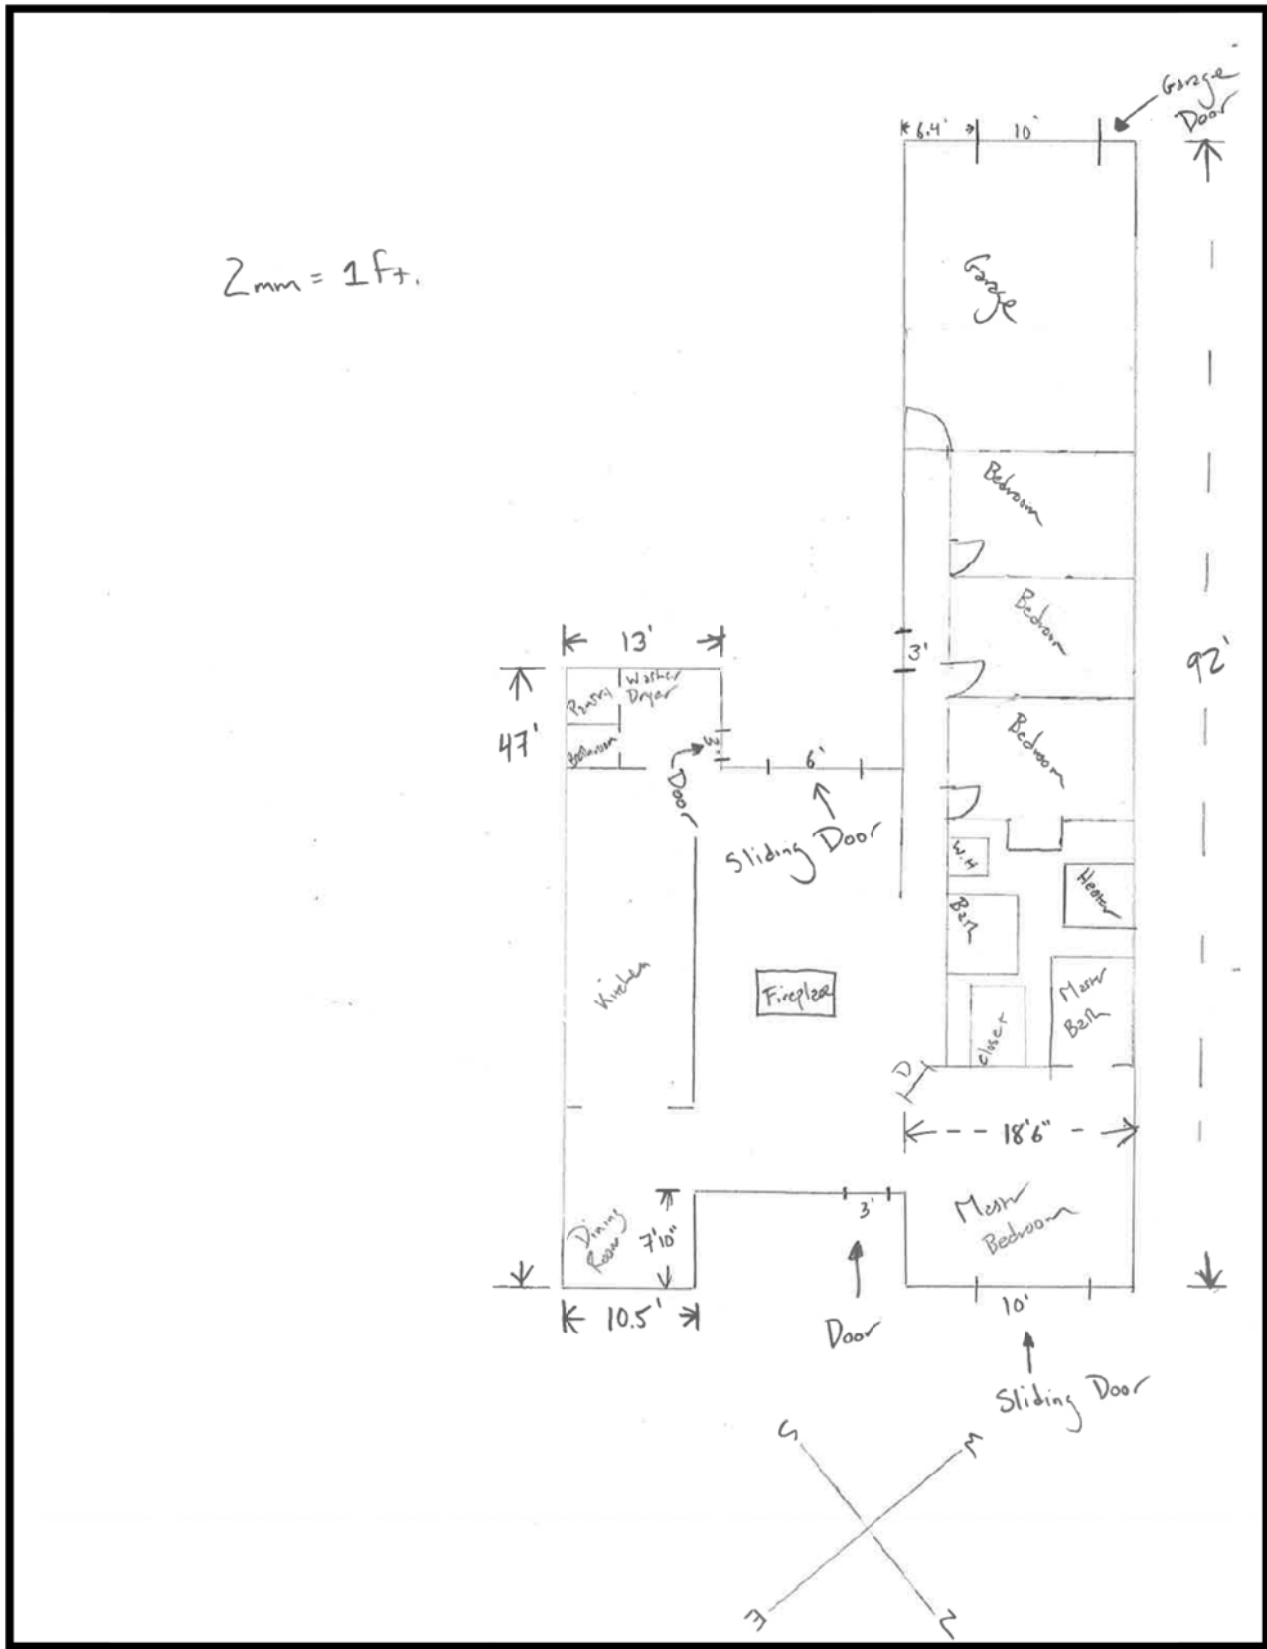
INTERIOR SITE PLAN FOR MONO LAKE HOUSE
